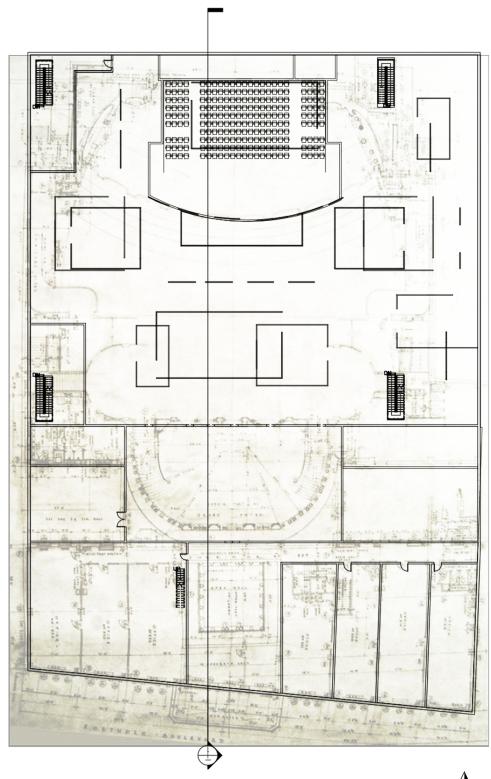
| Level 2 Floor Plan, with Level 1 Overlay
